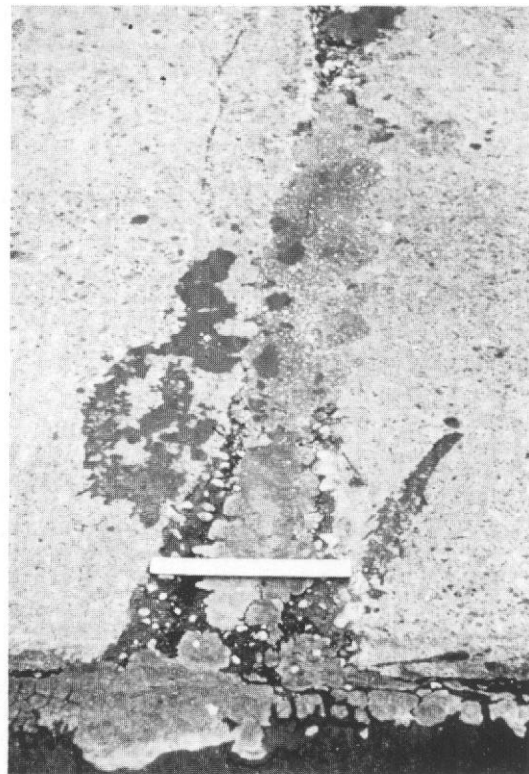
High-severity linear cracking in a nonreinforced concrete slab
